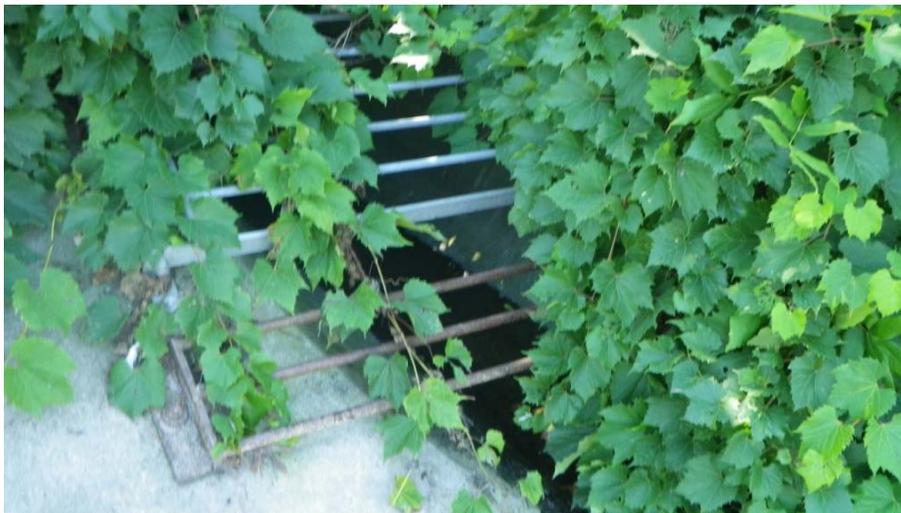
Storm Sewer Outlet North of Lakeshore Road Bridge
